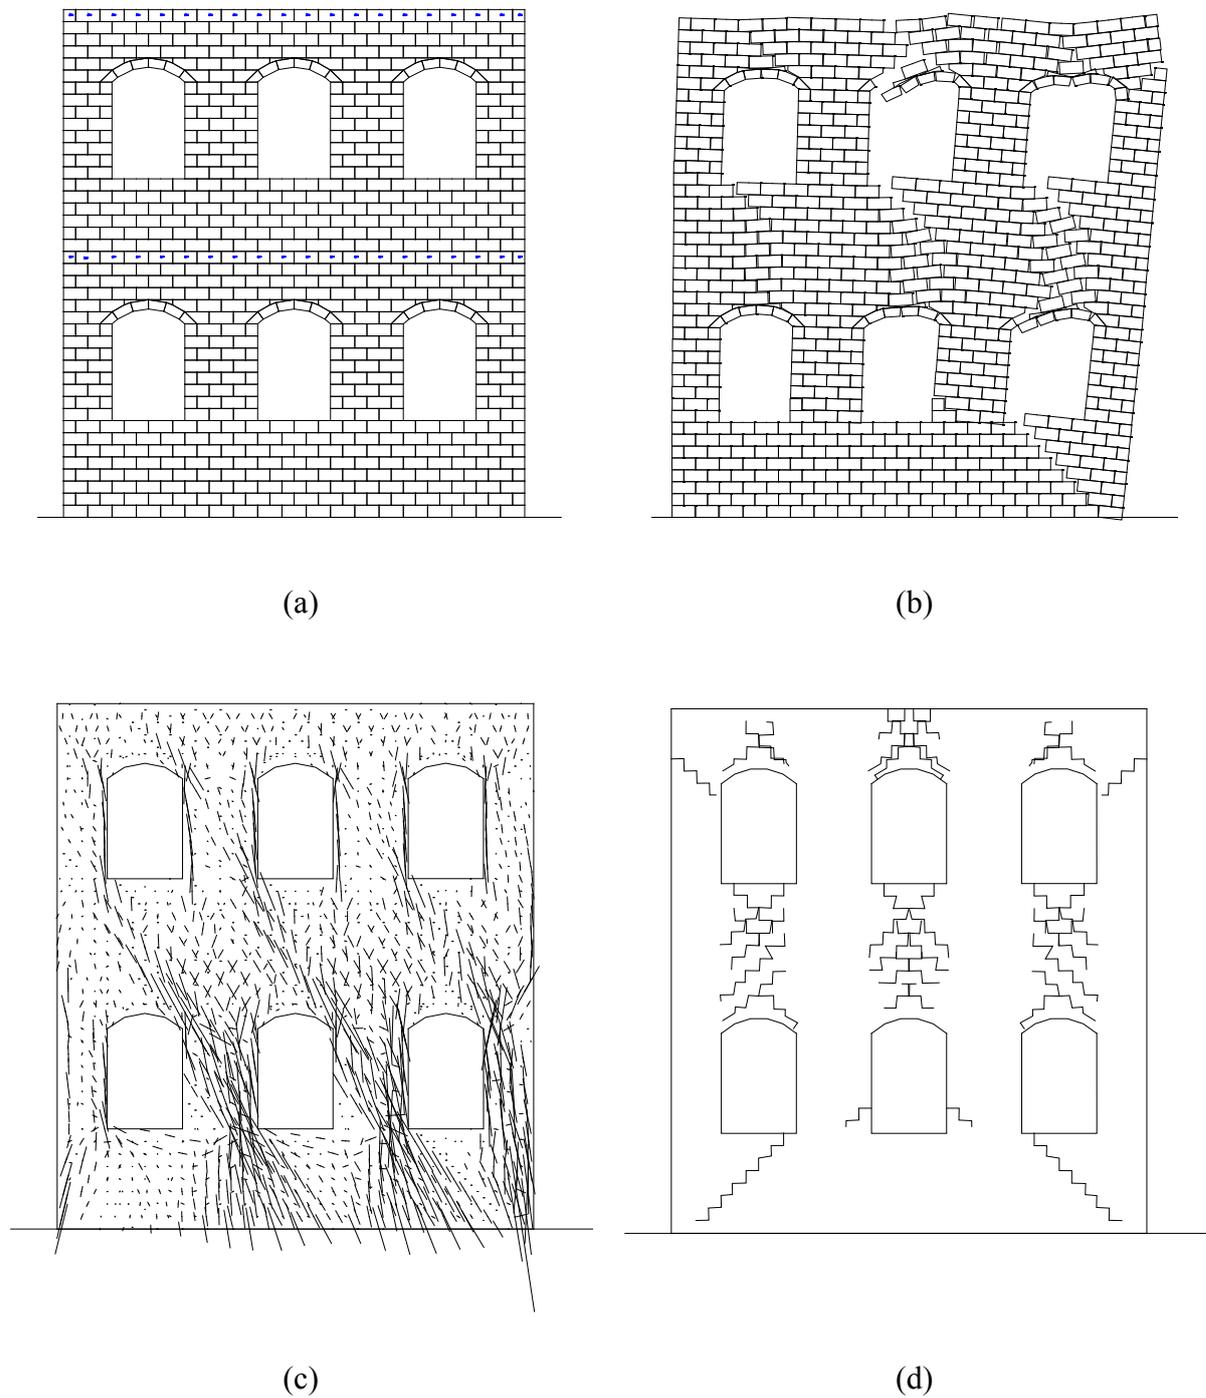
Standard Masonry wall 2; seismic coefficient,  $\alpha=0.446$ , (a) Block model, (b) Failure mechanism, (c) Thrust lines, (d) Crack pattern
